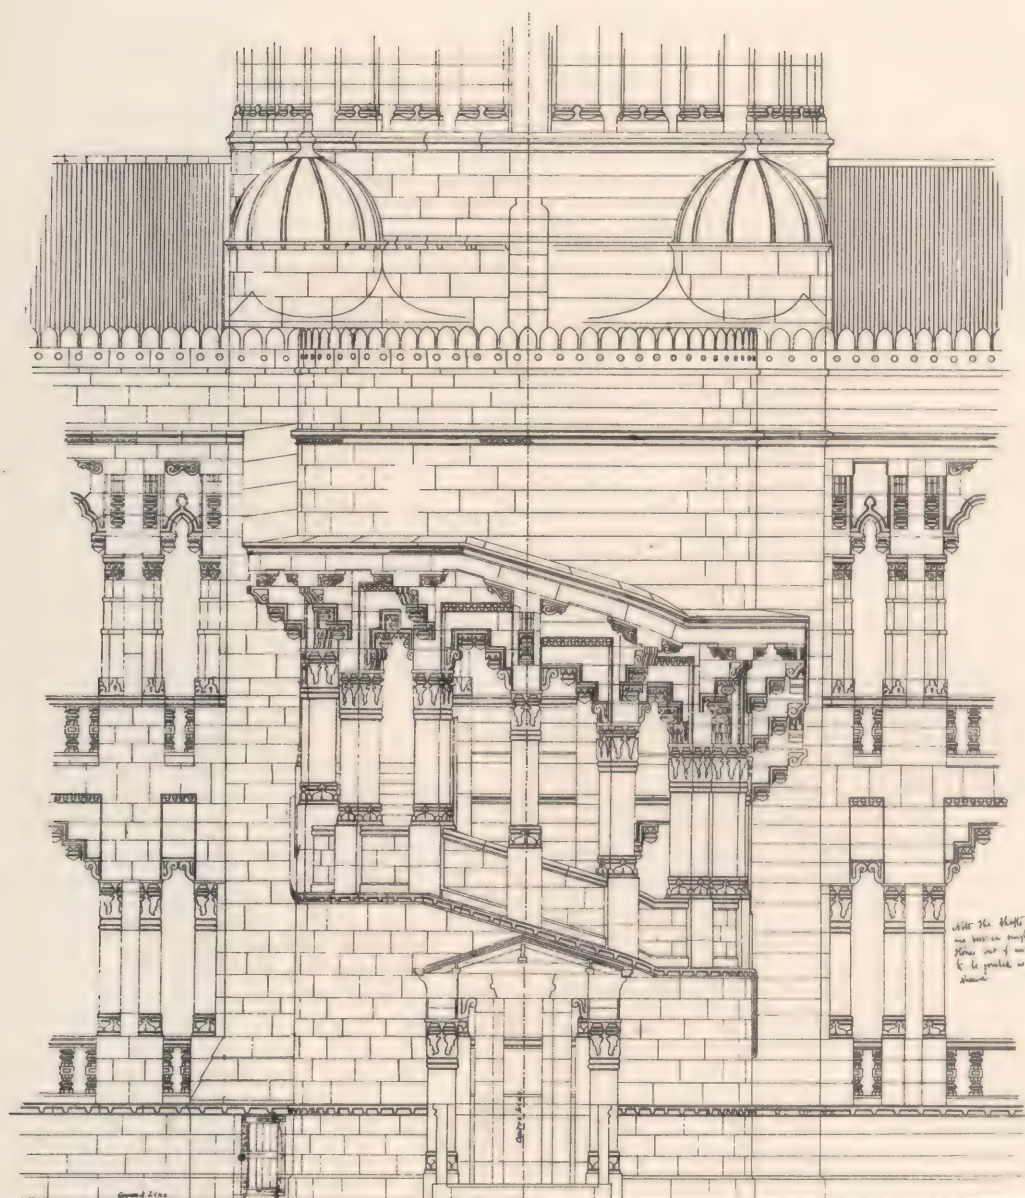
FRONT ELEVATION OF THE STAIRCASE.
